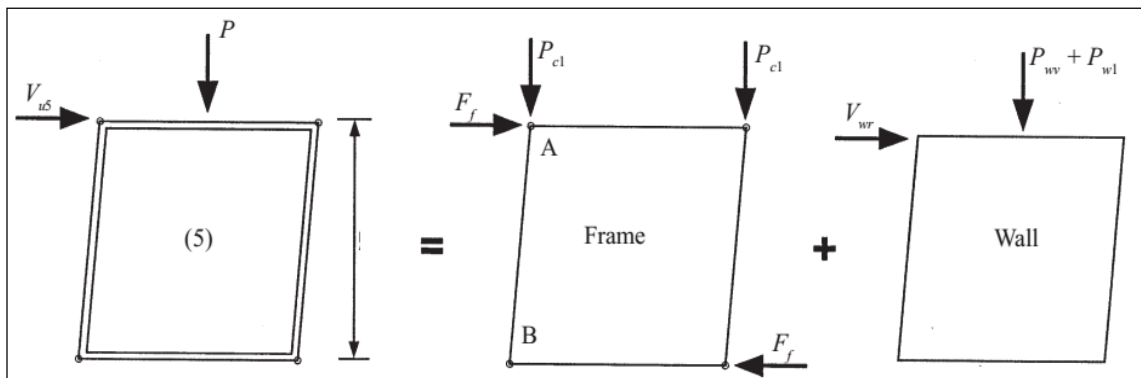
Failure mechanism 5 (Mehrabi & Shing, *Seismic Analysis of Masonry-Infilled Reinforced Concrete Frames*, 2003)
